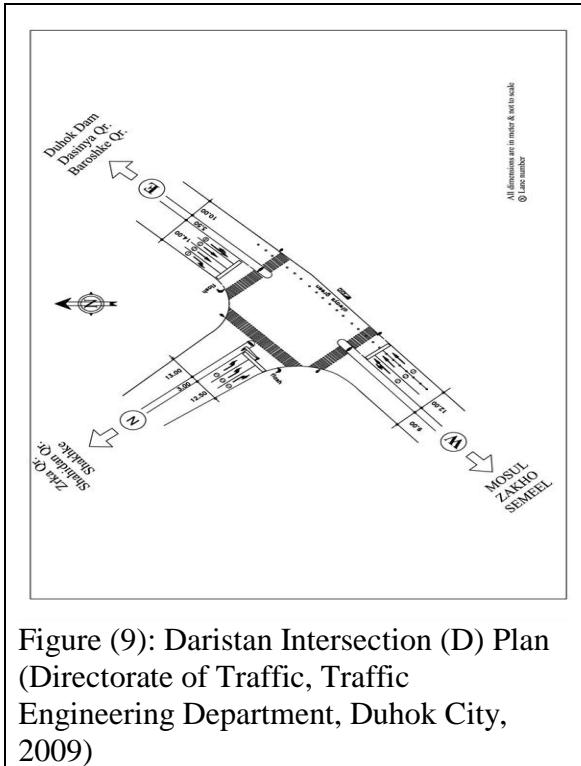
Daristan Intersection (D) Plan (Directorate of Traffic, Traffic Engineering Department, Duhok City, 2009)
